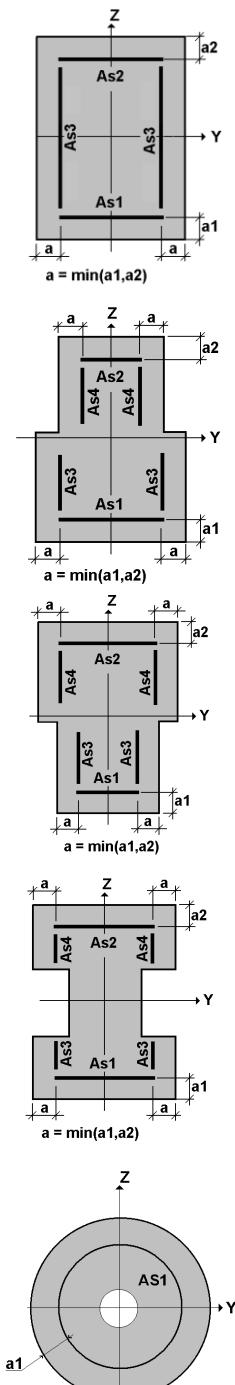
Arrangements of "areas" of longitudinal reinforcement
